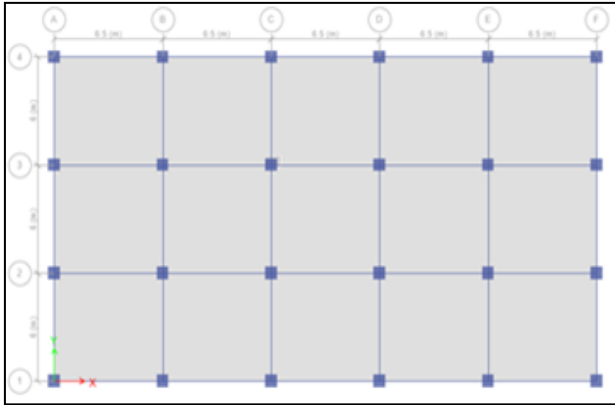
Model 1 – Floor Plan of the Structure without Shear Wall
